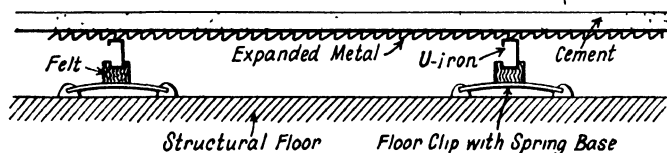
CONCRETE FLOATING FLOOR ON SPECIAL FLOOR CLIPS
